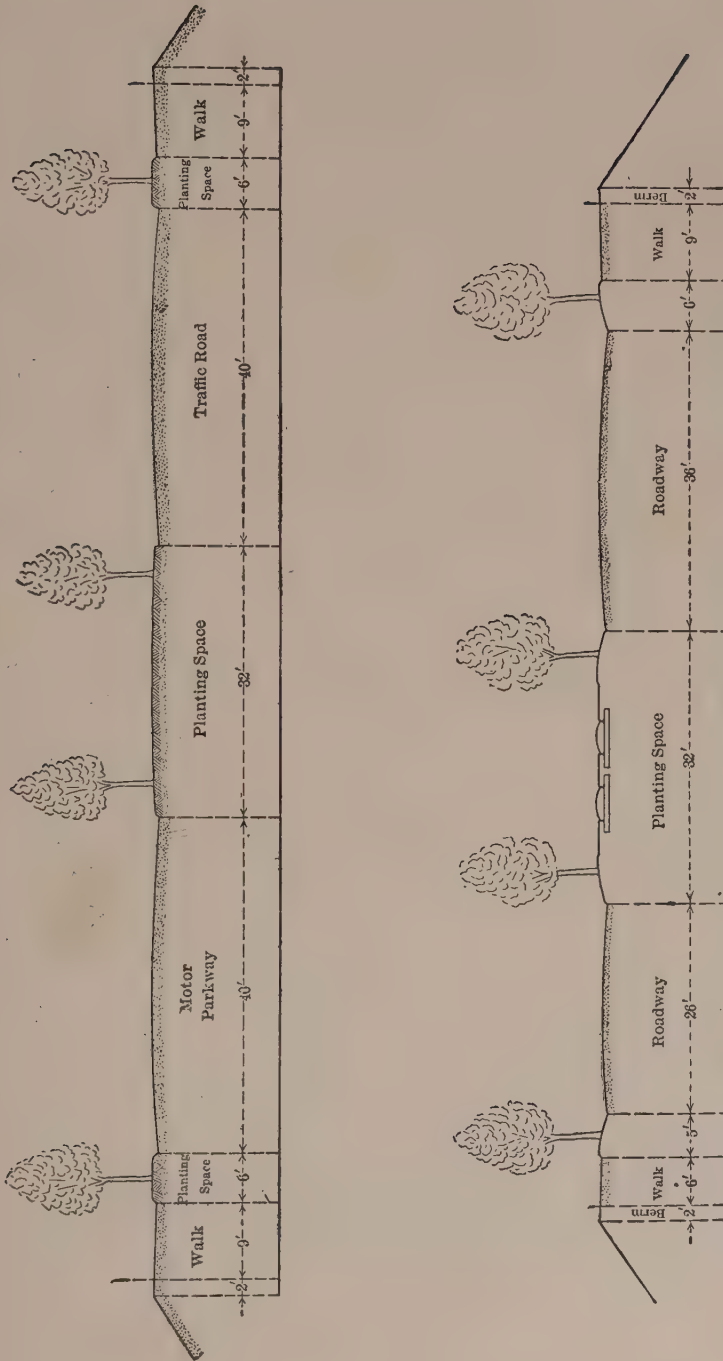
Typical Sections of Park Highways. Massachusetts Metropolitan Park Commission.
